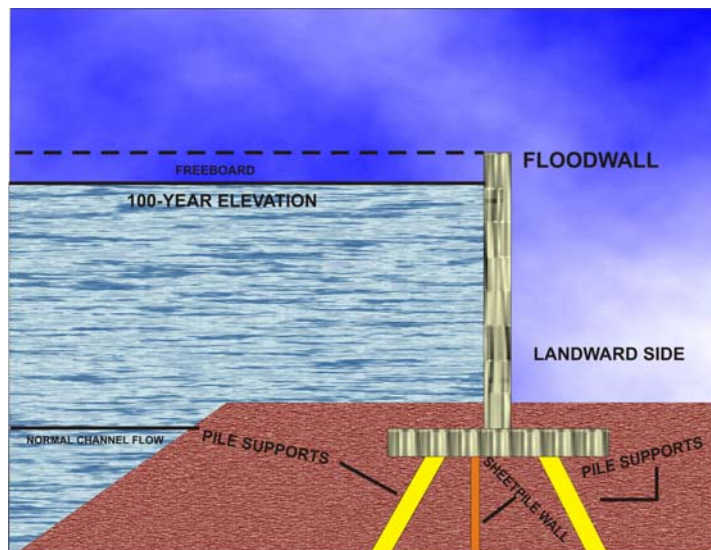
Floodwall Cross Section. In this figure, the floodwall is supported by piles and a sheet pile wall. Other floodwalls are supported only by a concrete "T" or similar base.
